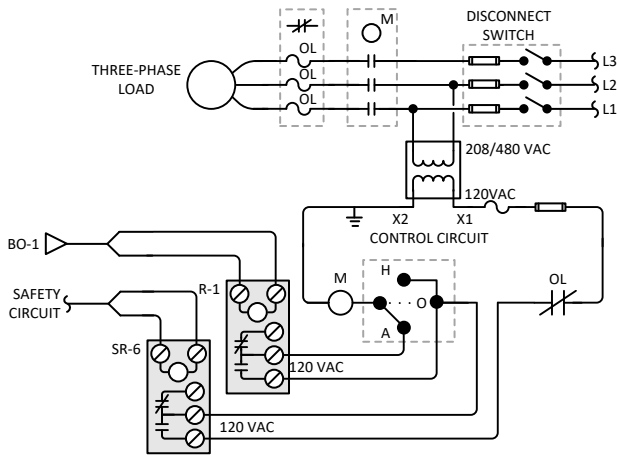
Motor starter Wiring with Interlocking Safety Relay (SR-6)
